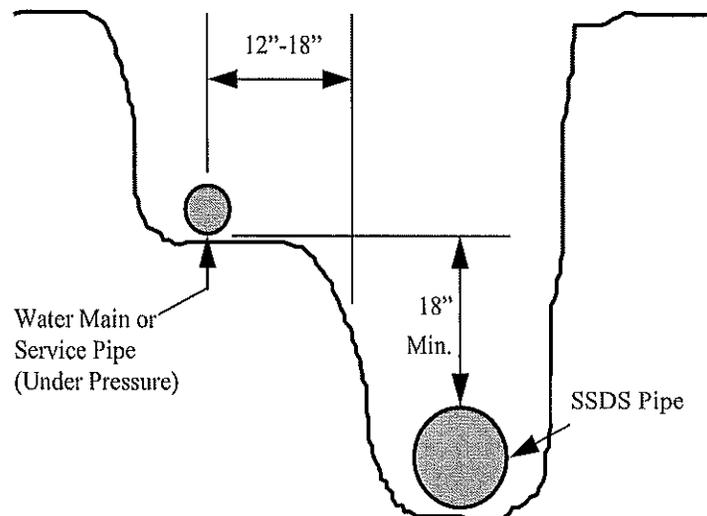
Pressurized Water Pipe and SSDS Pipe Trenches
